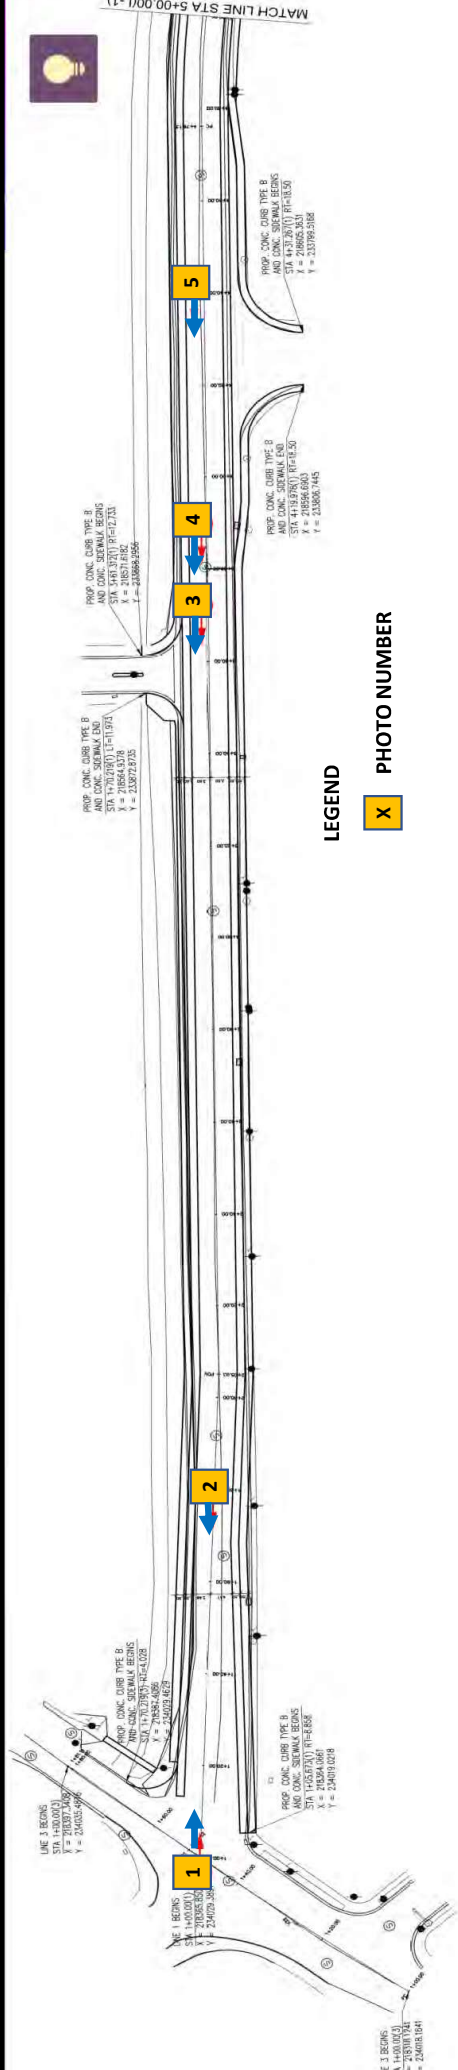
Photo, Location and Schematic Plan for the Proposed Project Section III Area
